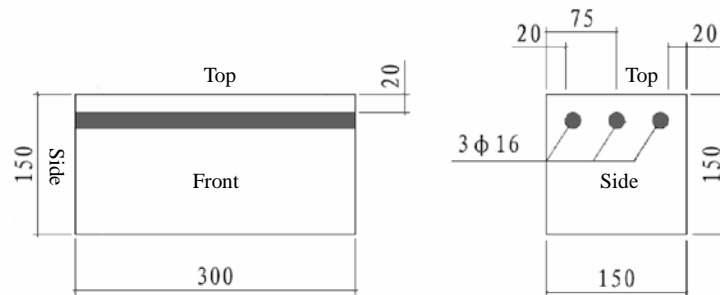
Schematic of the reinforced concrete panel showing the rebar arrangement (dimensions are in mm).
